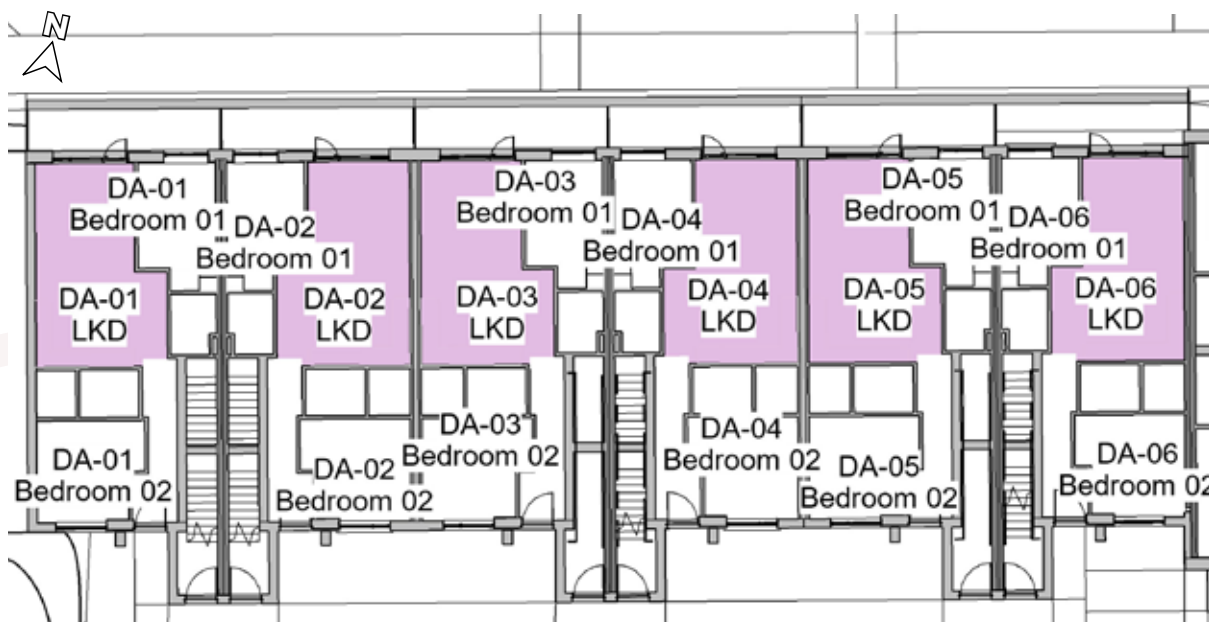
Duplex A Ground Floor: highlighted rooms below the minimum recommendations for SDA.
